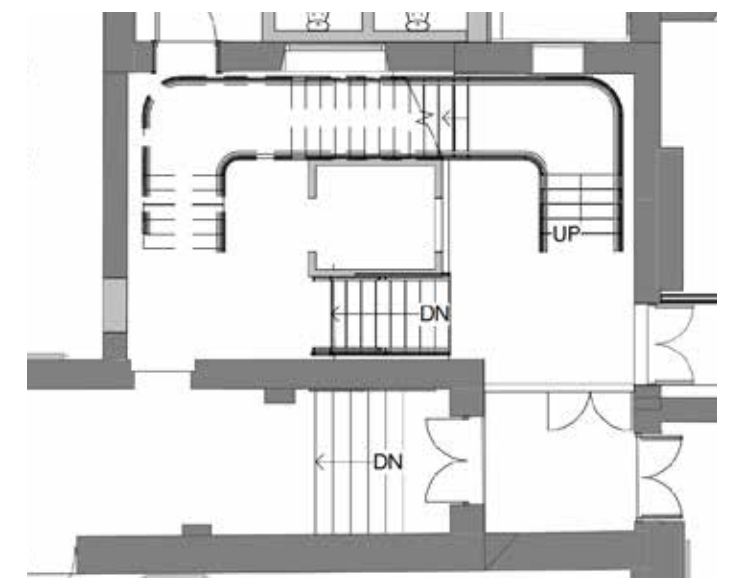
Proposed plan of the new staircase and central lift at ground floor level
